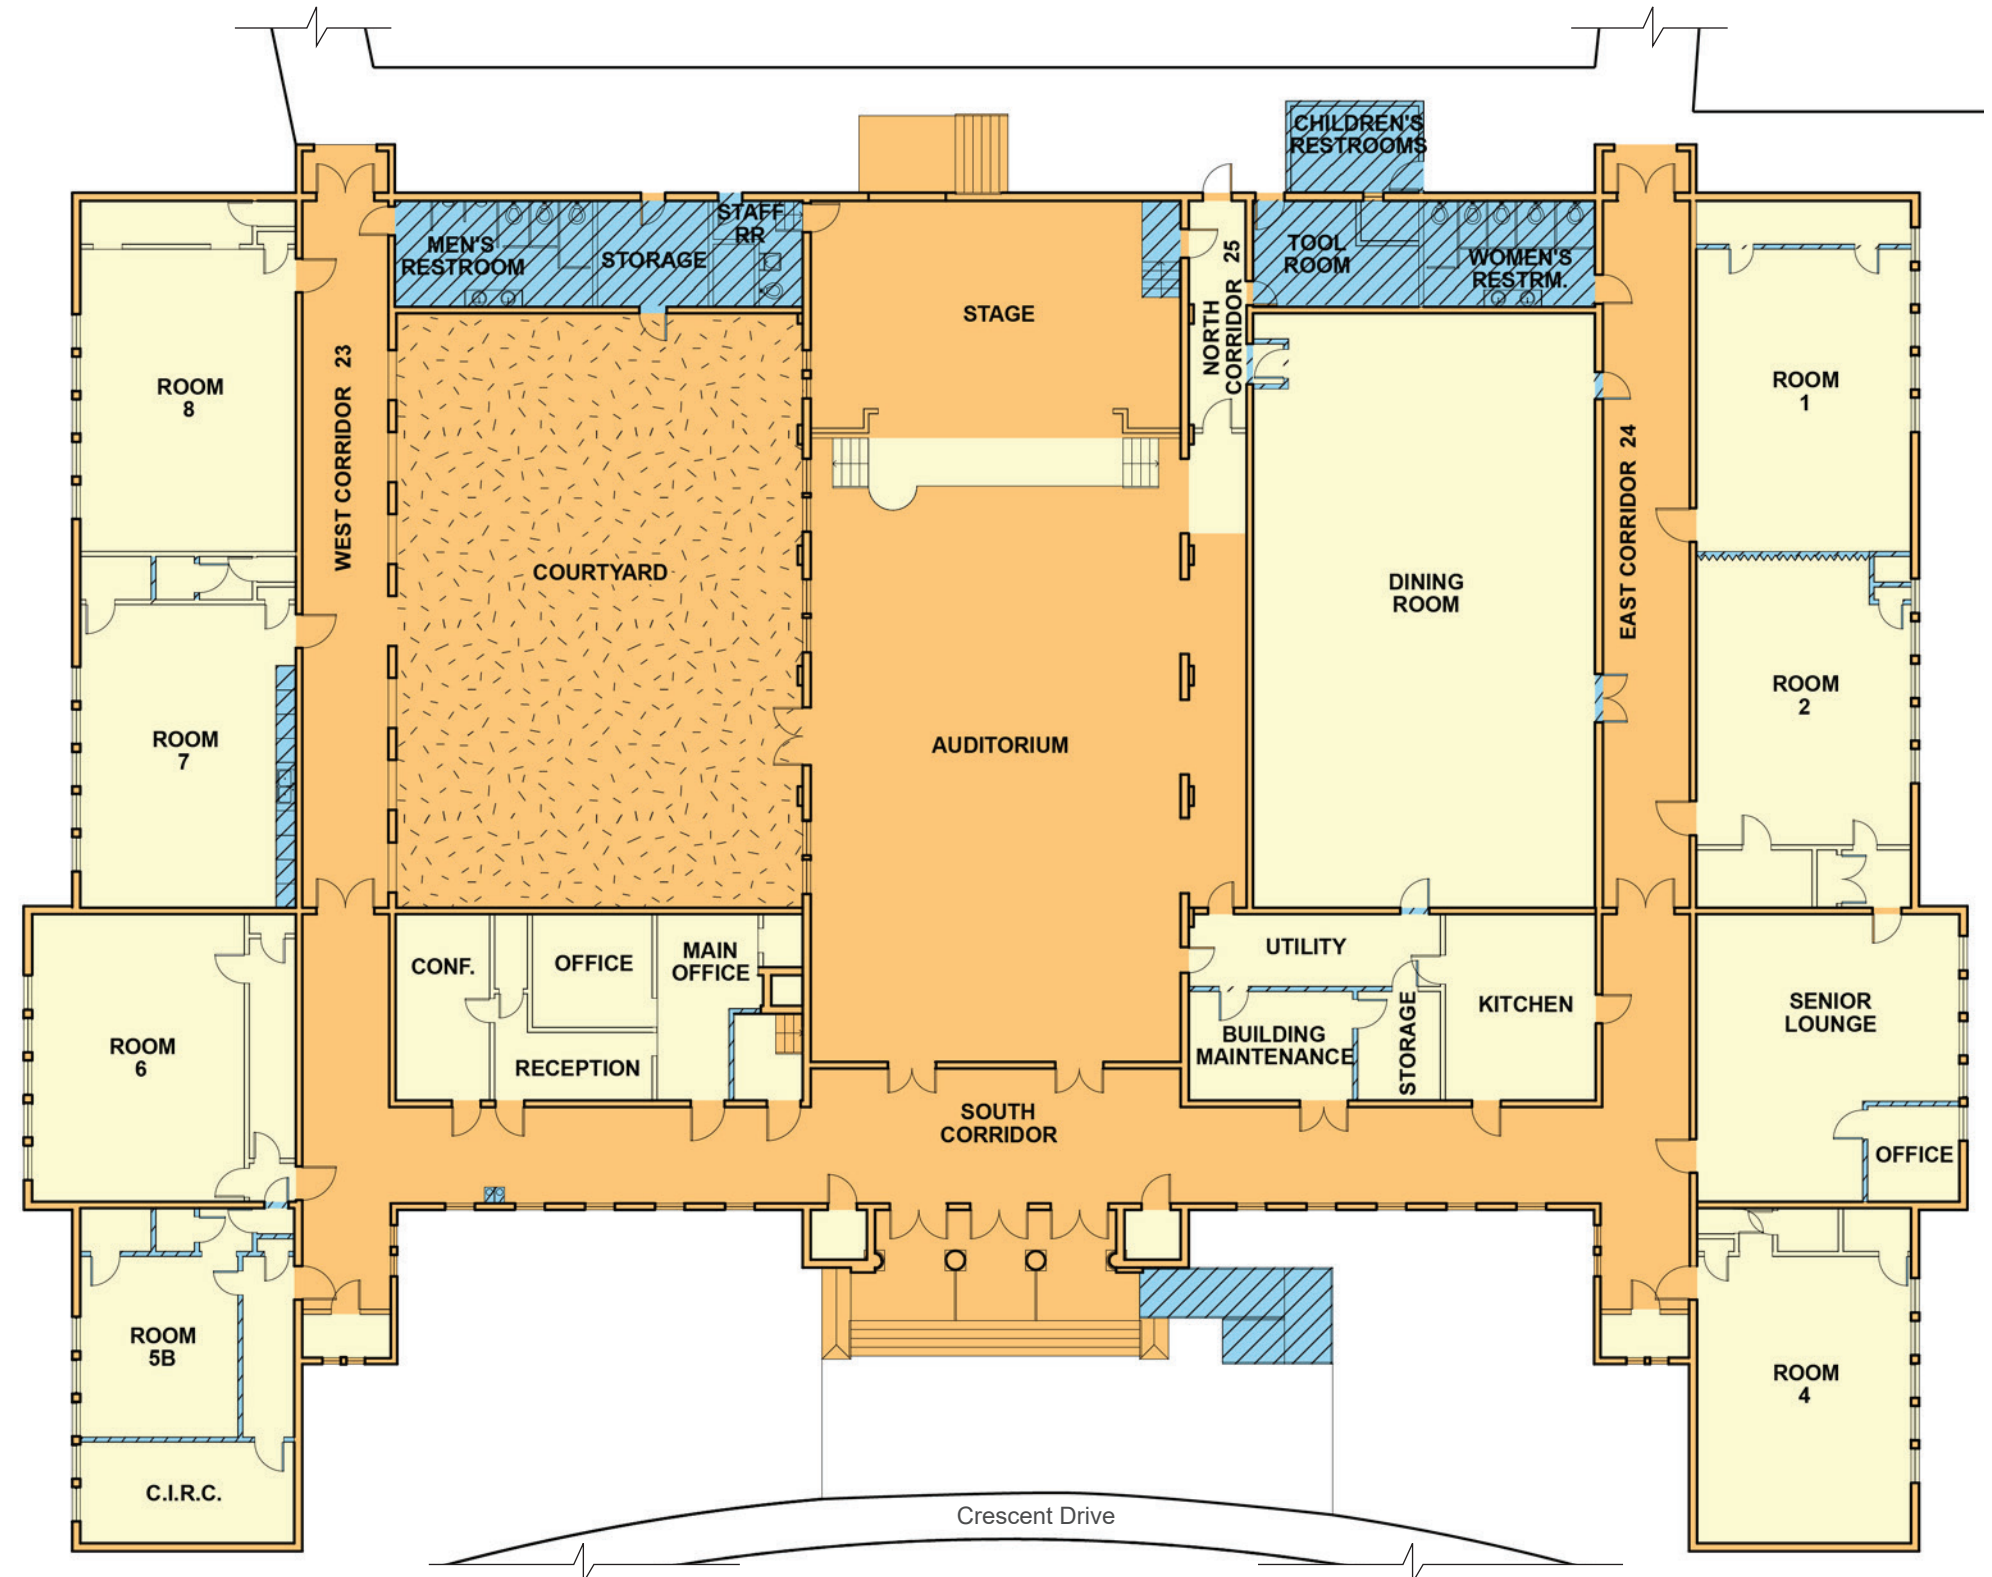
Adapted from Current Floor Plan, Main Building, 2016, RNT Architects.
